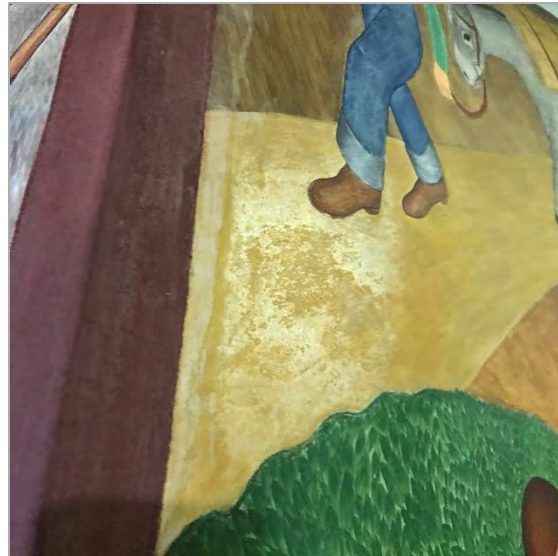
Location of observed efflorescence and other damages on the *Outdoor Life* mural.
